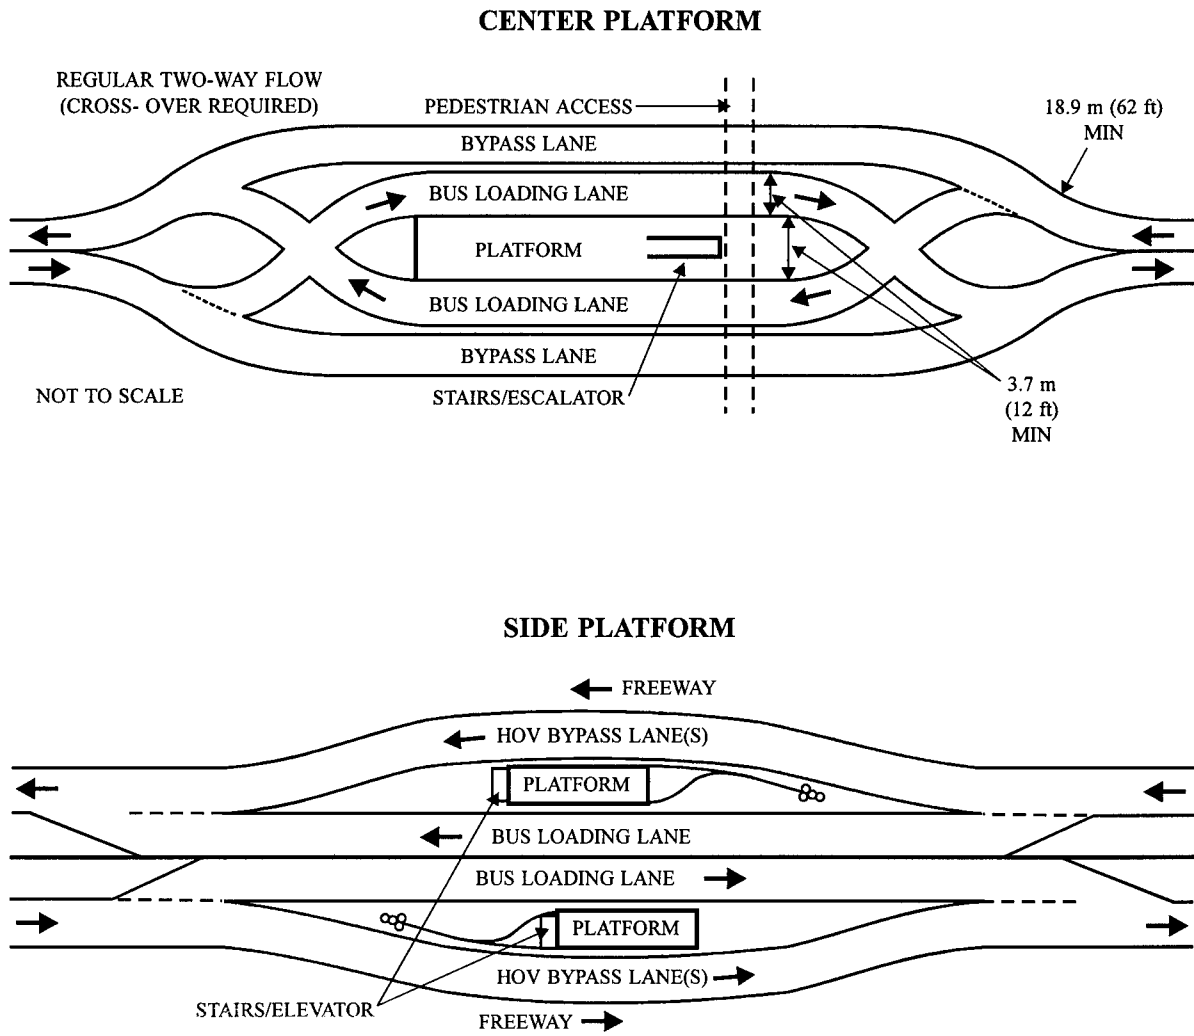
Example of Layouts for Center Platform and Side Platform for On-Line Transit Stations
